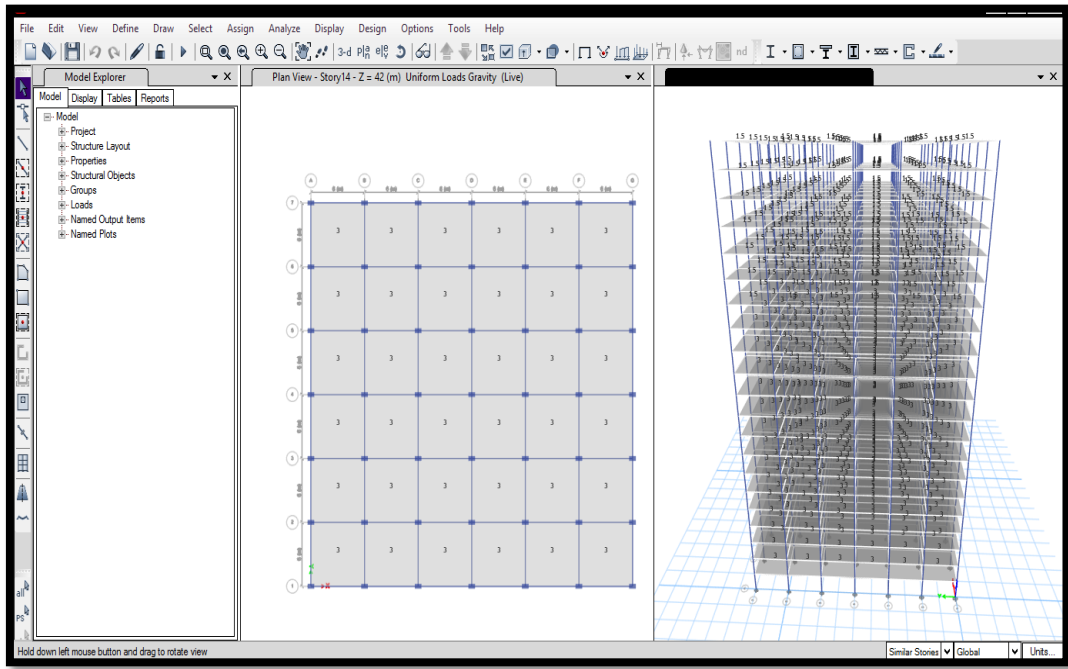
Total Dead load assigned on slab for high rise building
